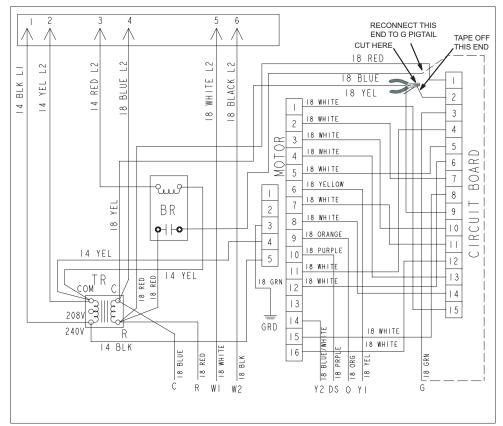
Electrical Adjustments for Air Handler Control CBX25UHV
